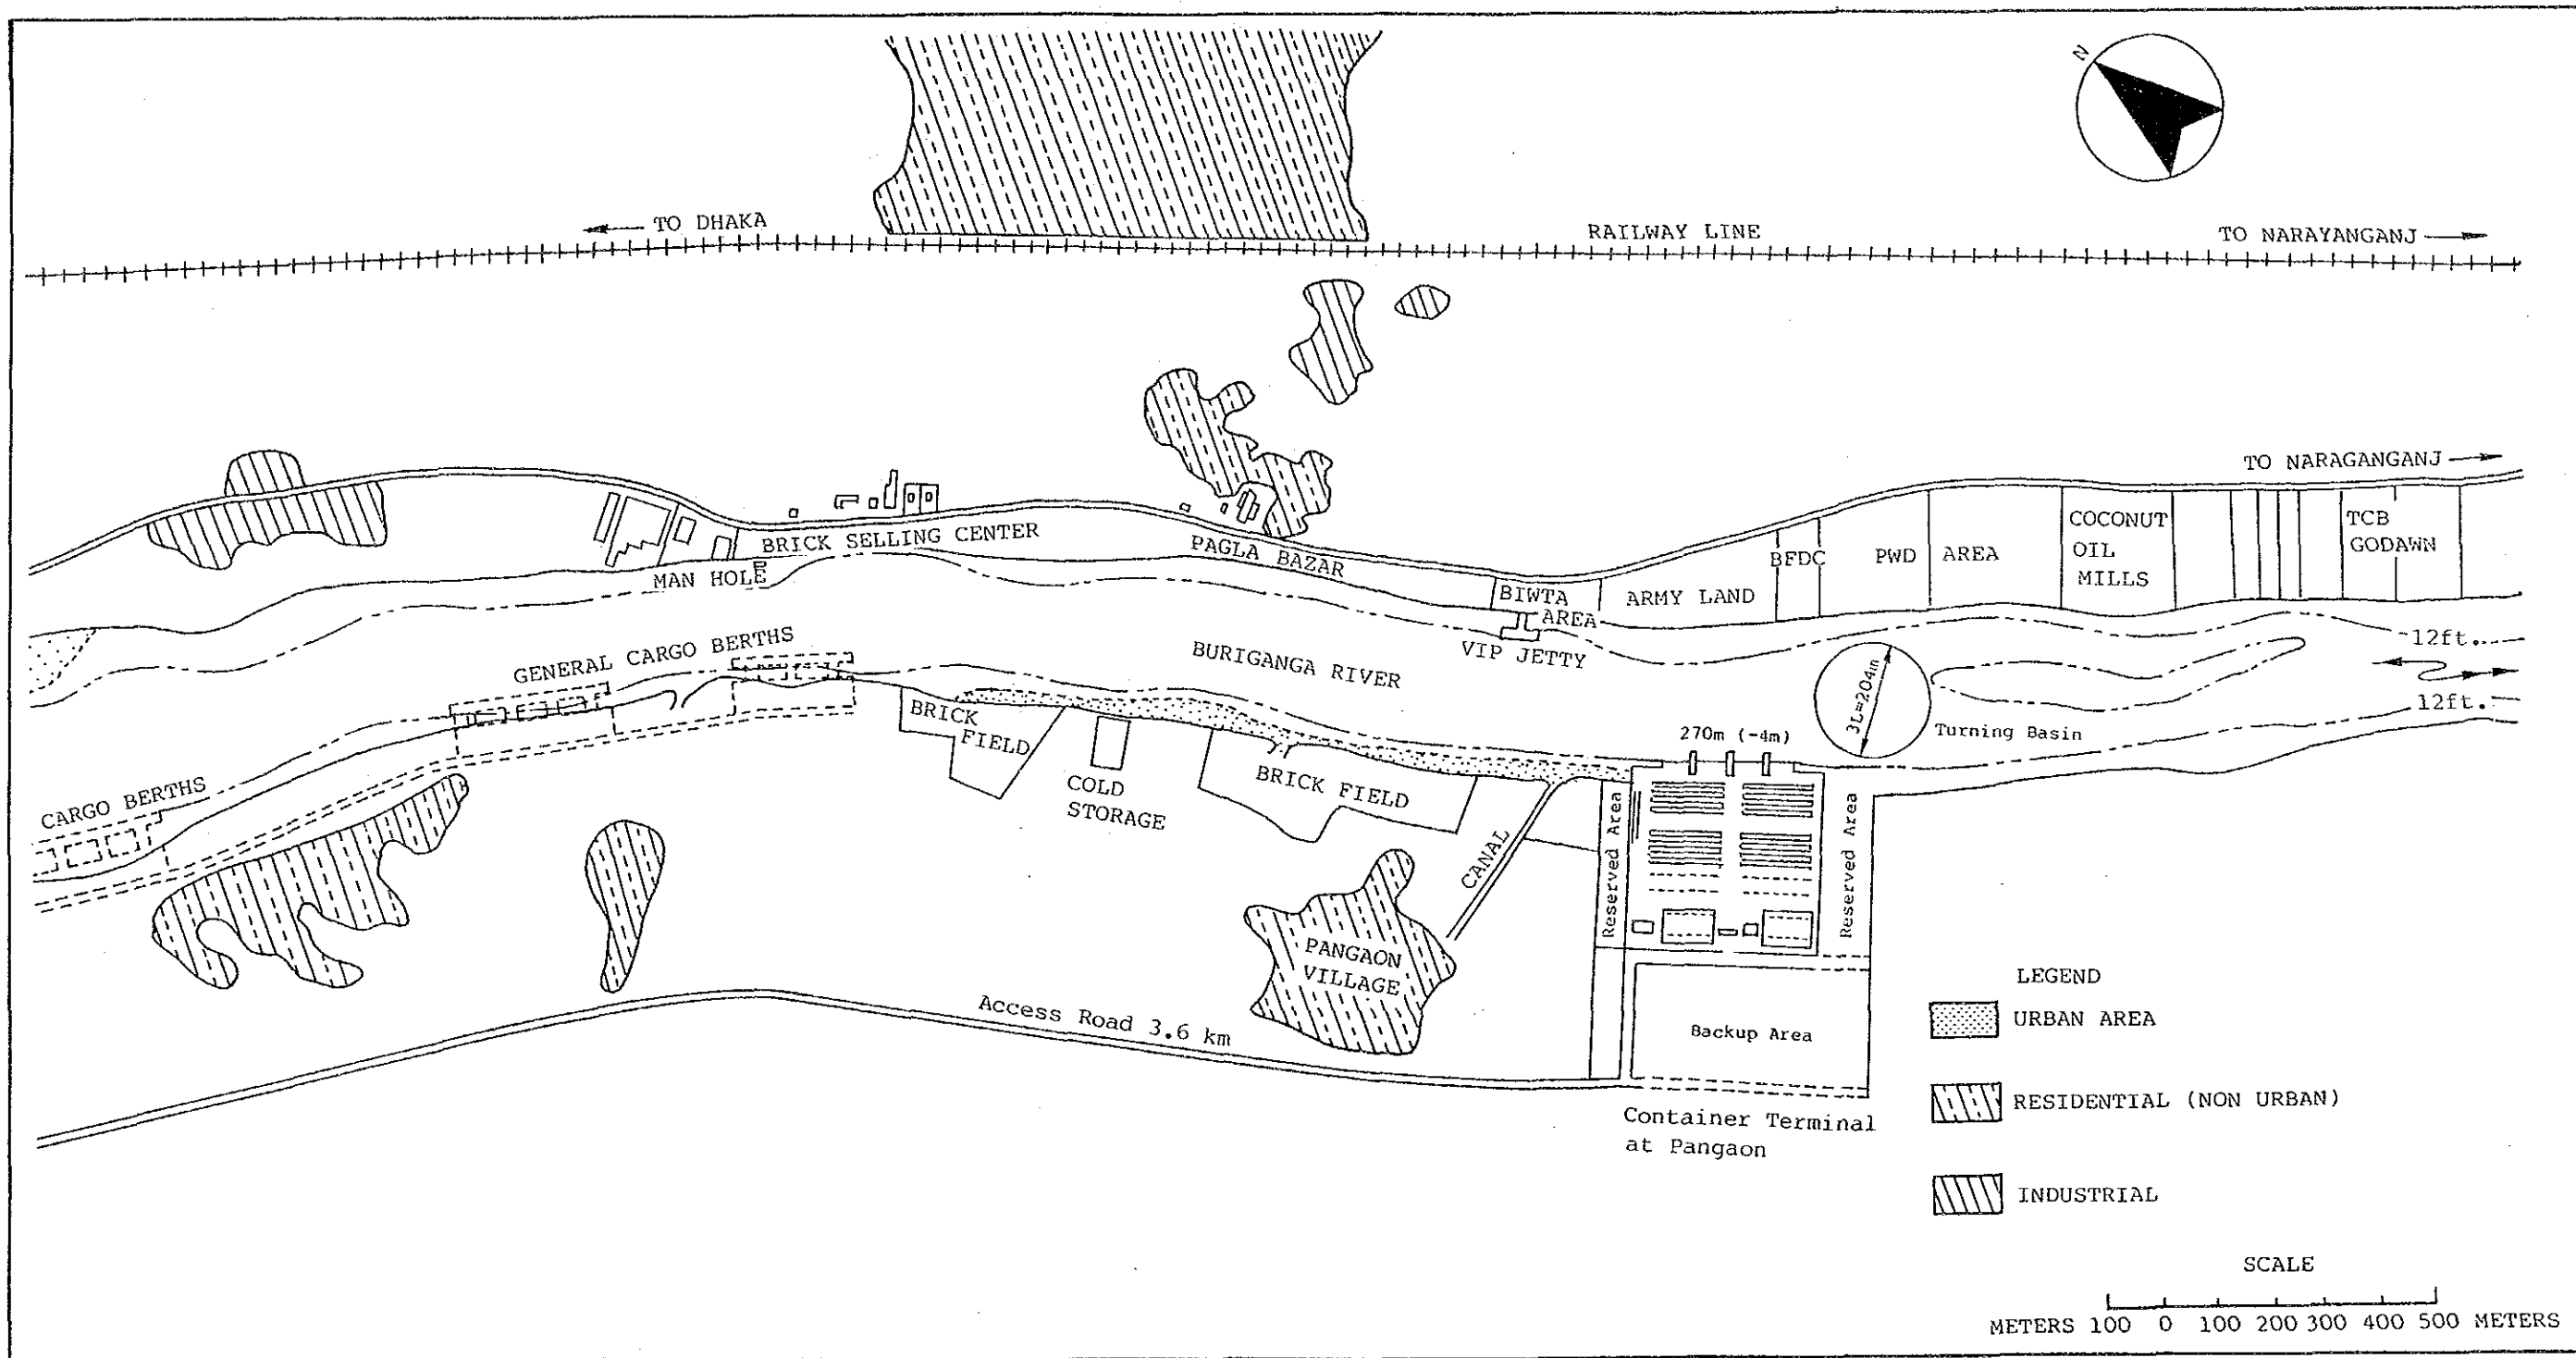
Alternative Development Plan at Pangaon Site - Case 1
